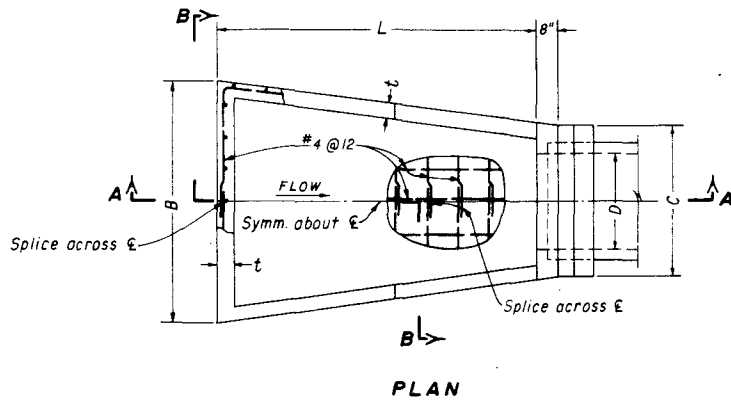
Concrete transitions—type 2. 103-D-1290
